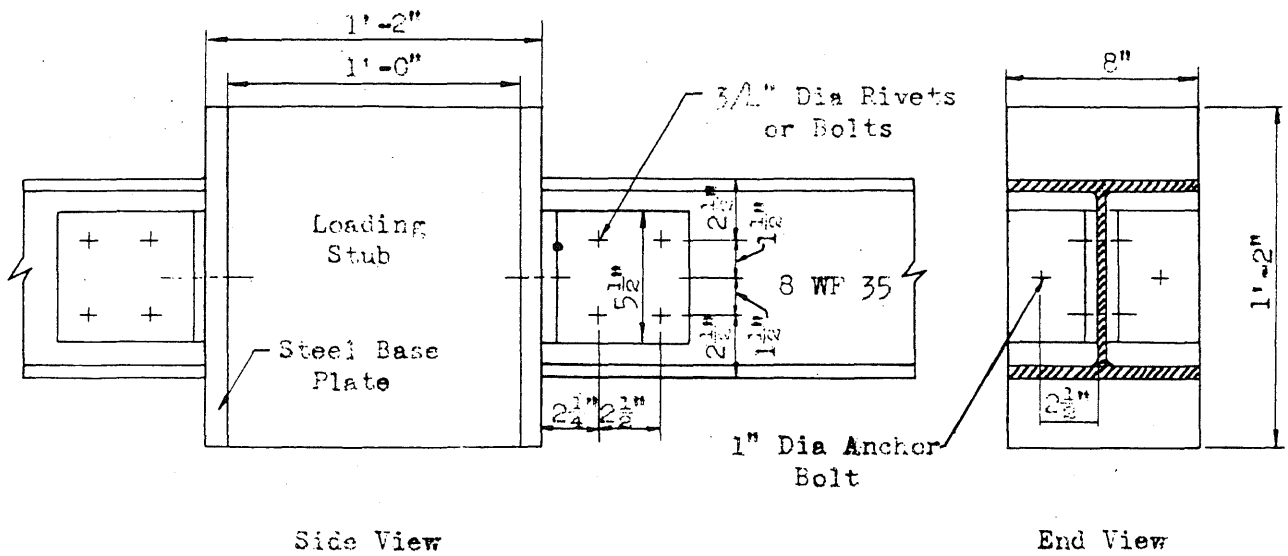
SCHEMATIC DRAWING OF TESTING ARRANGEMENT FOR COLUMN-BASE CONNECTIONS
